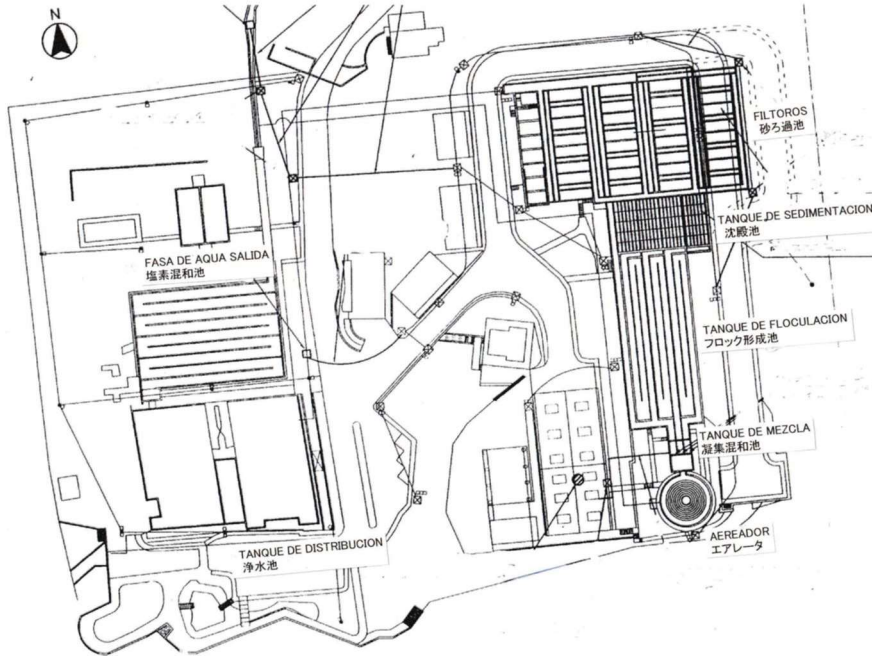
General Plan of Picacho Drinking Water Treatment Plant
